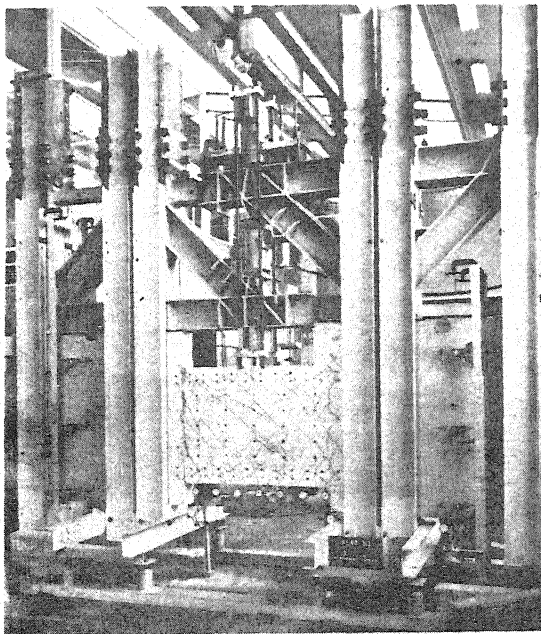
Shear Wall Beam in Testing Frame. A Diagonal Compression Failure.
